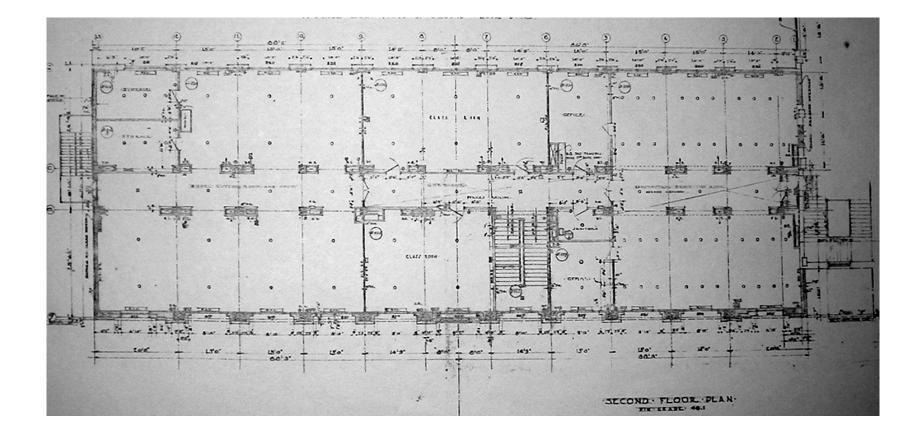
Photo of the Second Floor Plan of the Pratt School of Naval Architecture.
